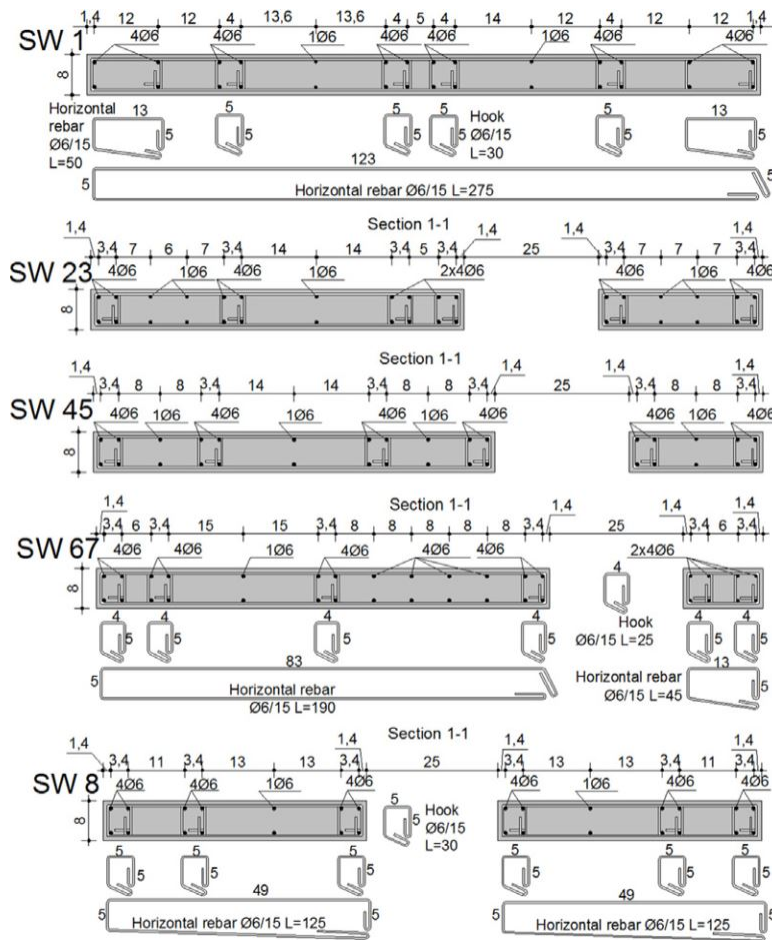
Cross-sections at the base story for the walls tested by Marius [44] (units in cm).
